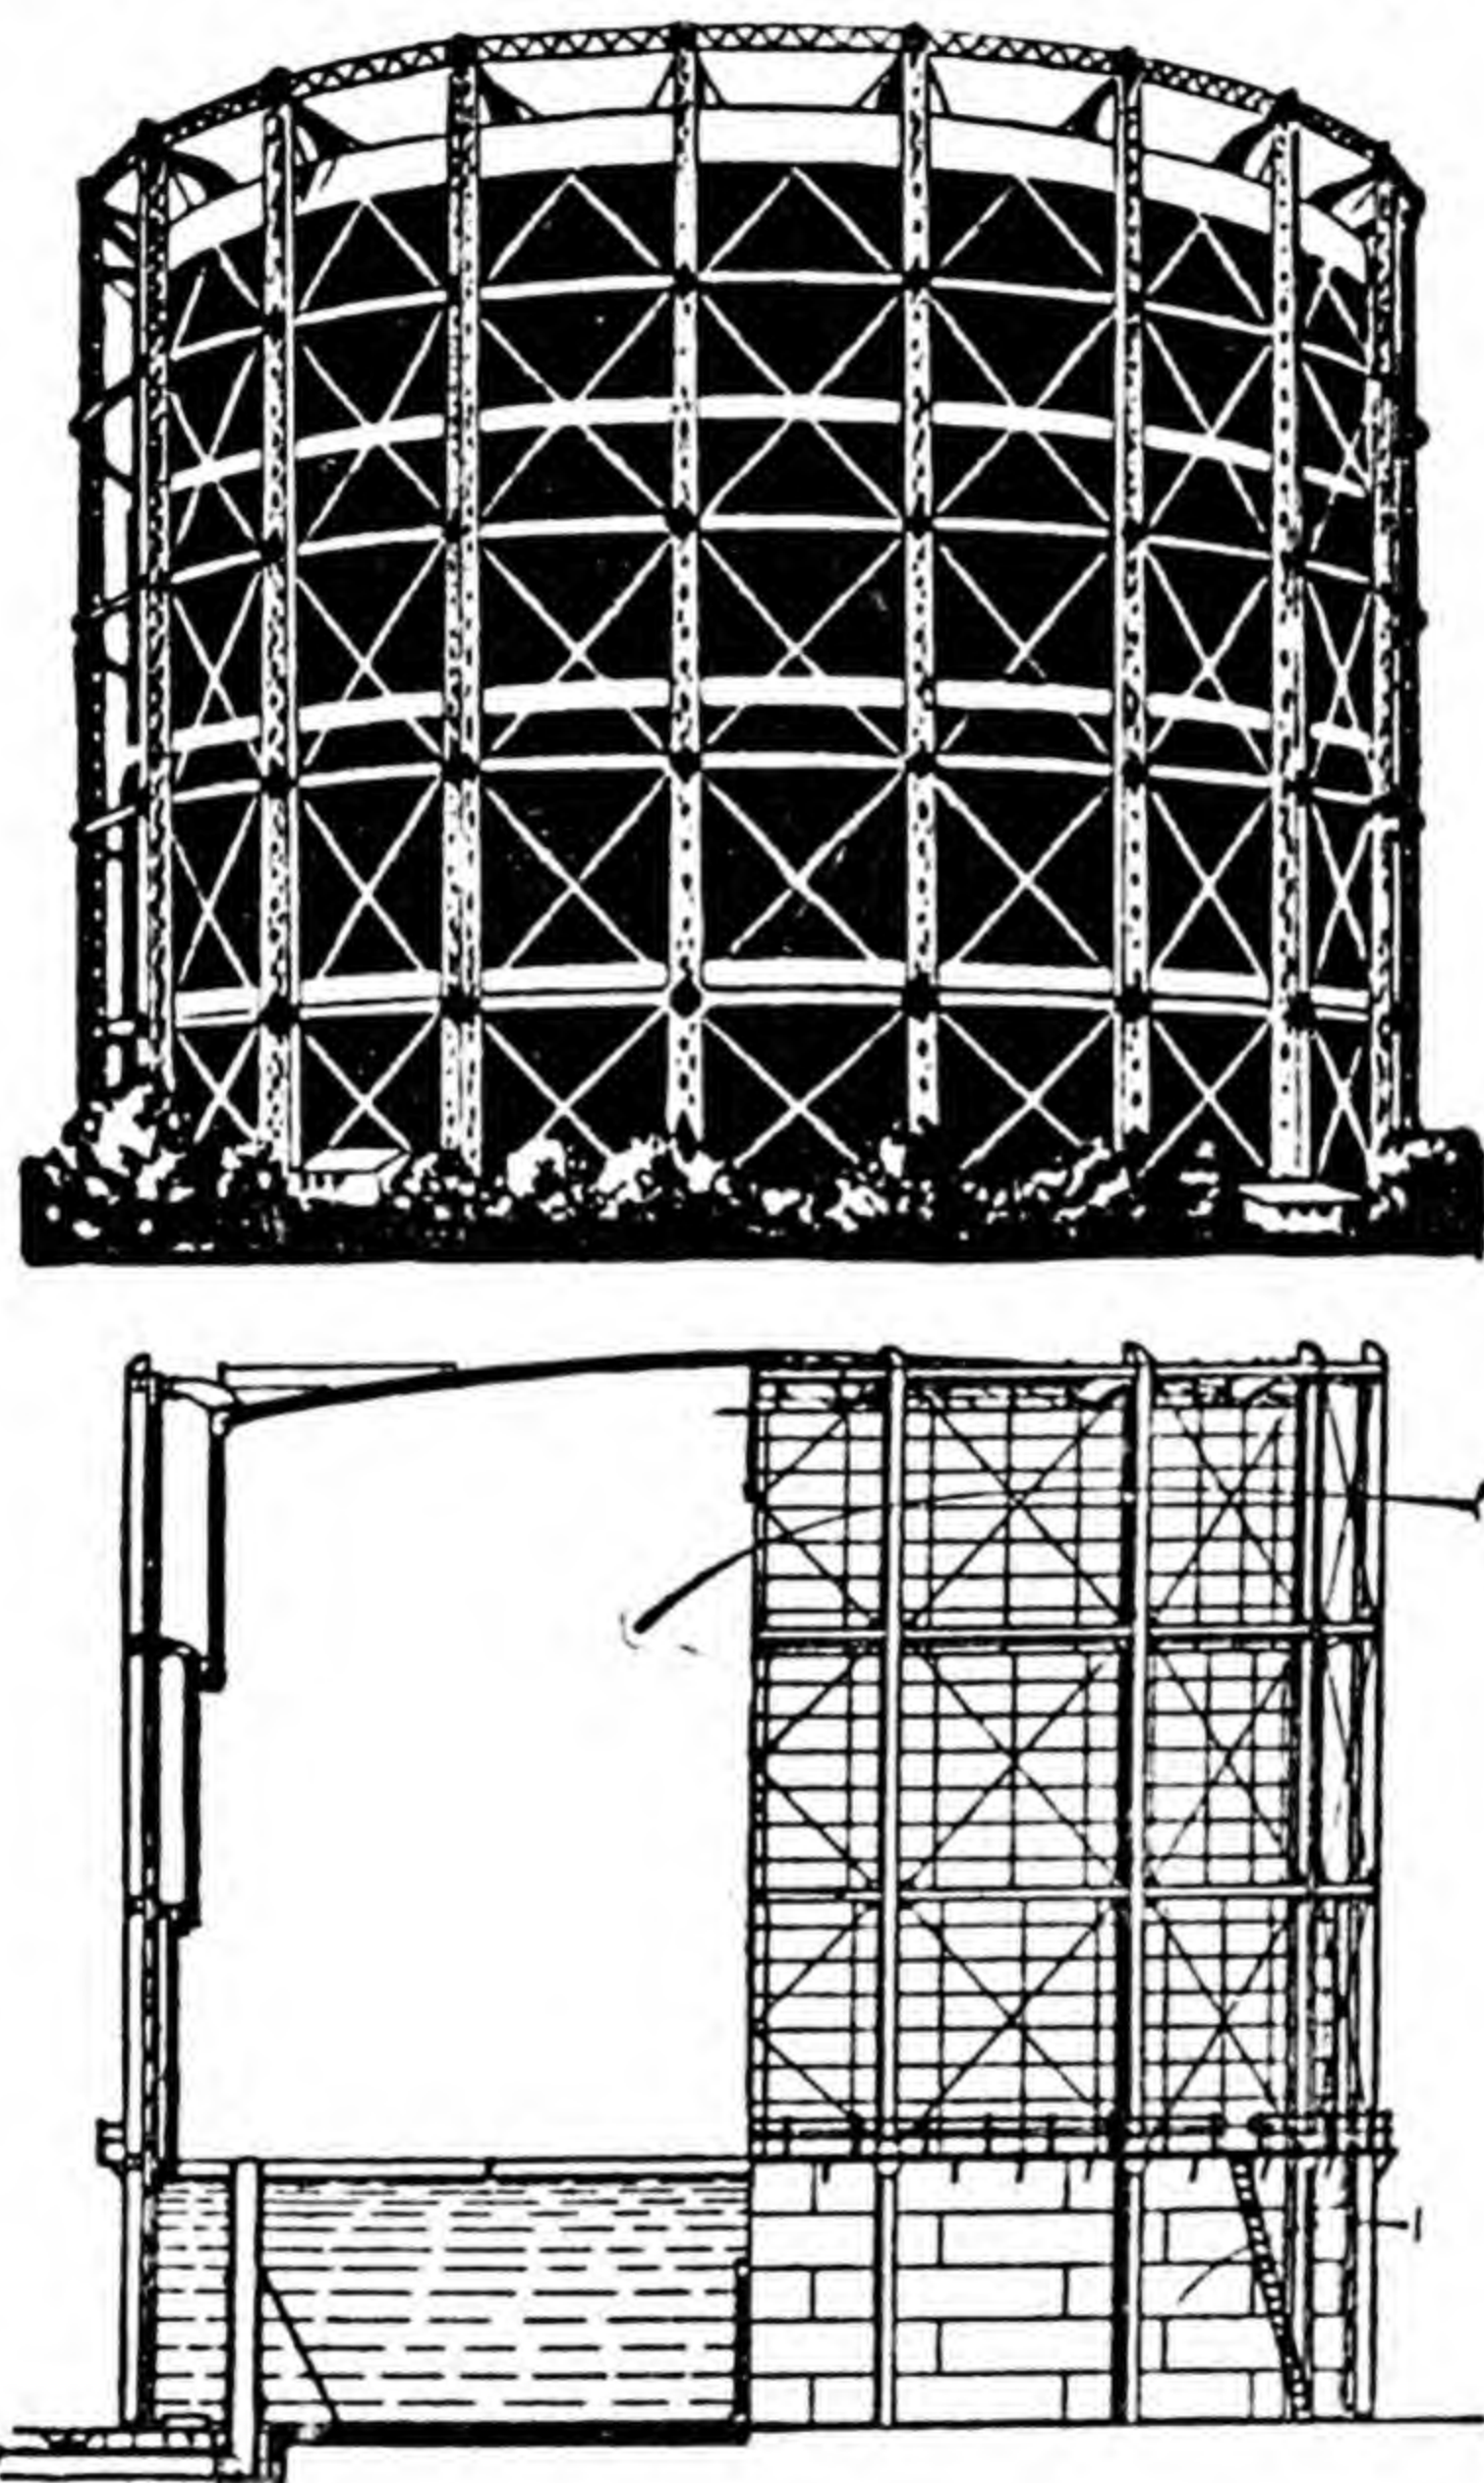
Telescope gas-holder: above, outside view; below, section, to show how it works.
